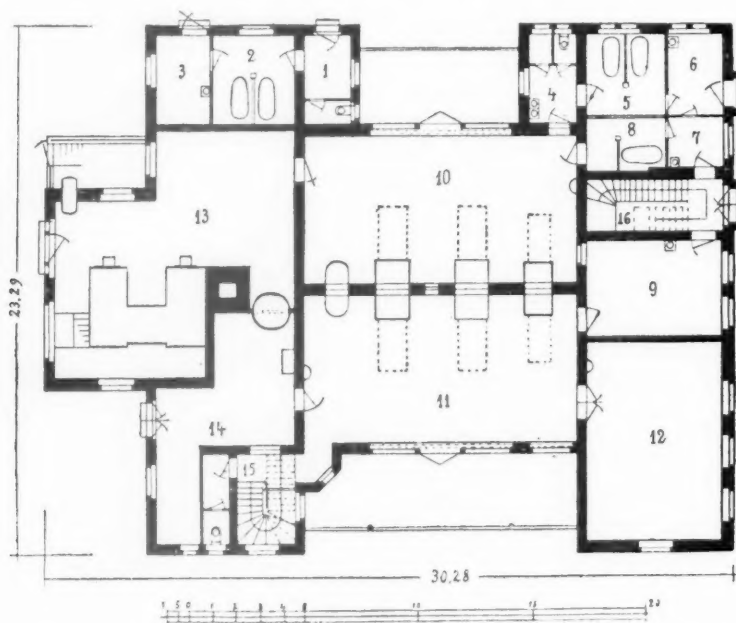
GROUND FLOOR PLAN OF THE DISINFECTIOIN BLOCK, CHARLOTTENBURG WEST END HOSPITAL.
